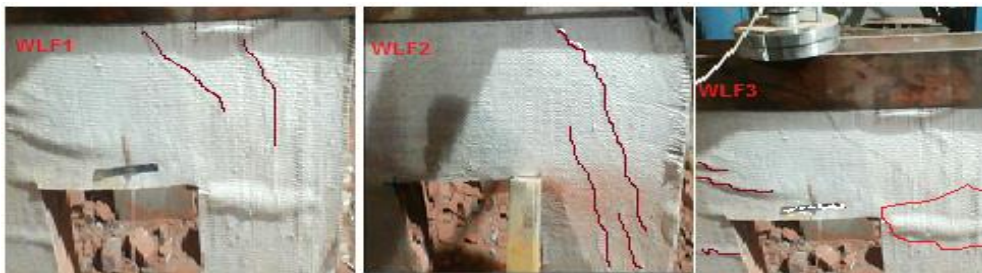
Failure mode for walls strengthened with GFRP strips
